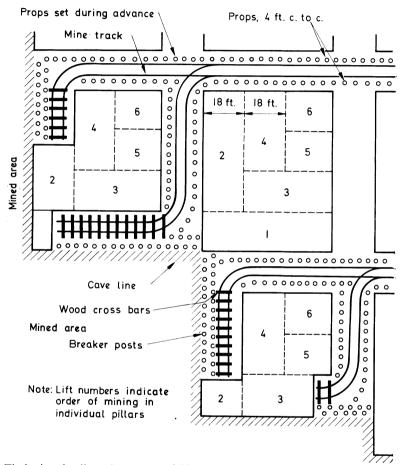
Timbering details and sequence of lifts used in conjunction with extraction of pillars by the open-end method at Mine 65.⁽⁴⁾
